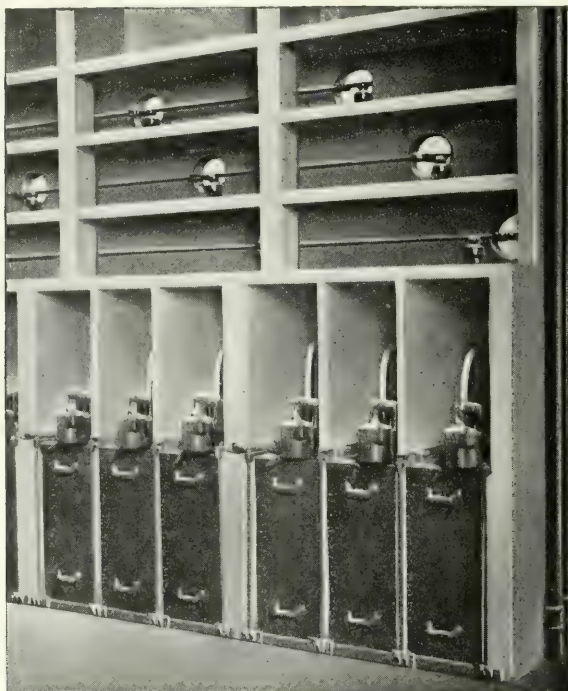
FRONT VIEW OF SECTION OF A CONCRETE SWITCH-
